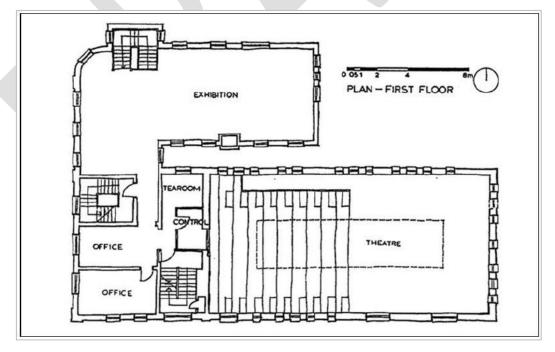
First Floor plan, showing the configuration of the building in 1990. (Source: Bligh Robertson Architects, Sydney Sailor's Home (former) (106-8 George Street) Conservation Plan, (Feb 1990))
